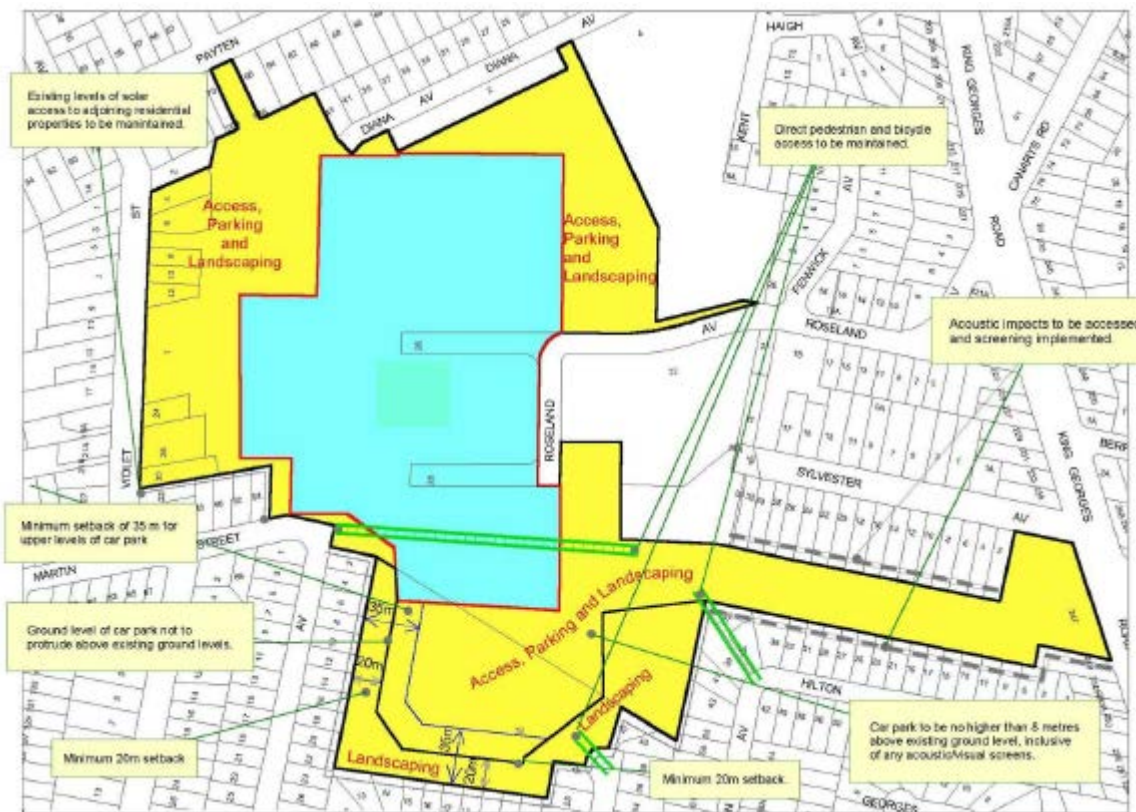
| Extract of Figure 3.6.1 – Roselands Structure Plan
